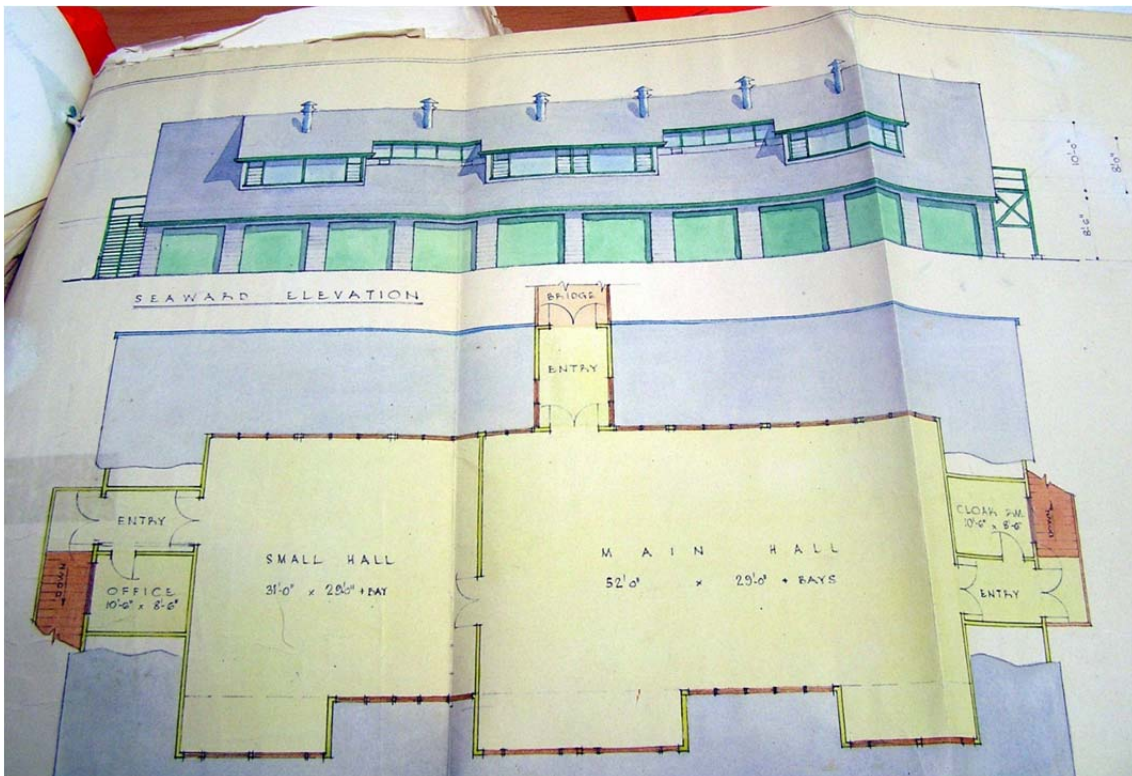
L.H. Vernon & Associates, Upper Floor Plan & Seaward Elevation of proposed Boat Club Building, 2 February 1954. Source: Crown Land Reserve file Rs 5154, Department of Sustainability and Environment, Geelong.
